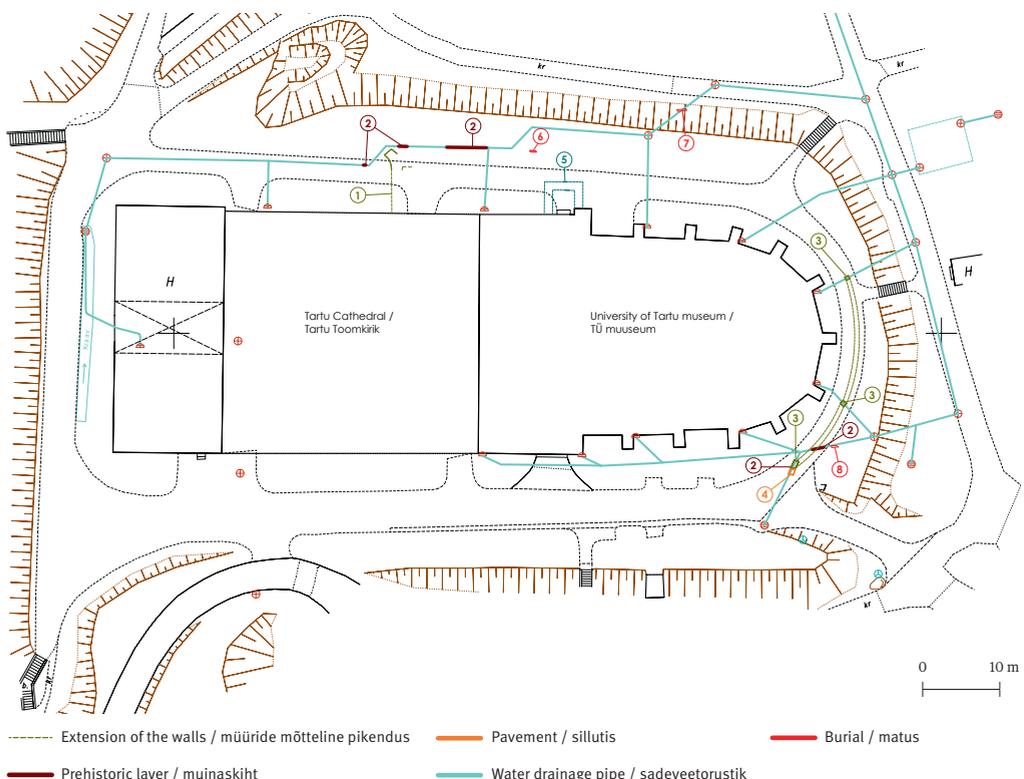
Location of the trenches around the Cathedral. 1 – northern porch/chapel, 2 – prehistoric layer, 3 – foundation of the churchyard wall, 4 – stone pavement, 5 – foundations of the chapel at the northeastern corner of the nave, 6–8 – burials 1–3 discovered by the Cathedral.
